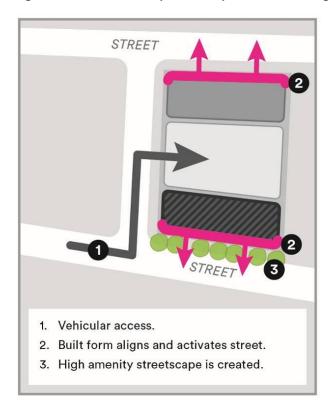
U Example of acceptable single frontage site treatment (parking)
